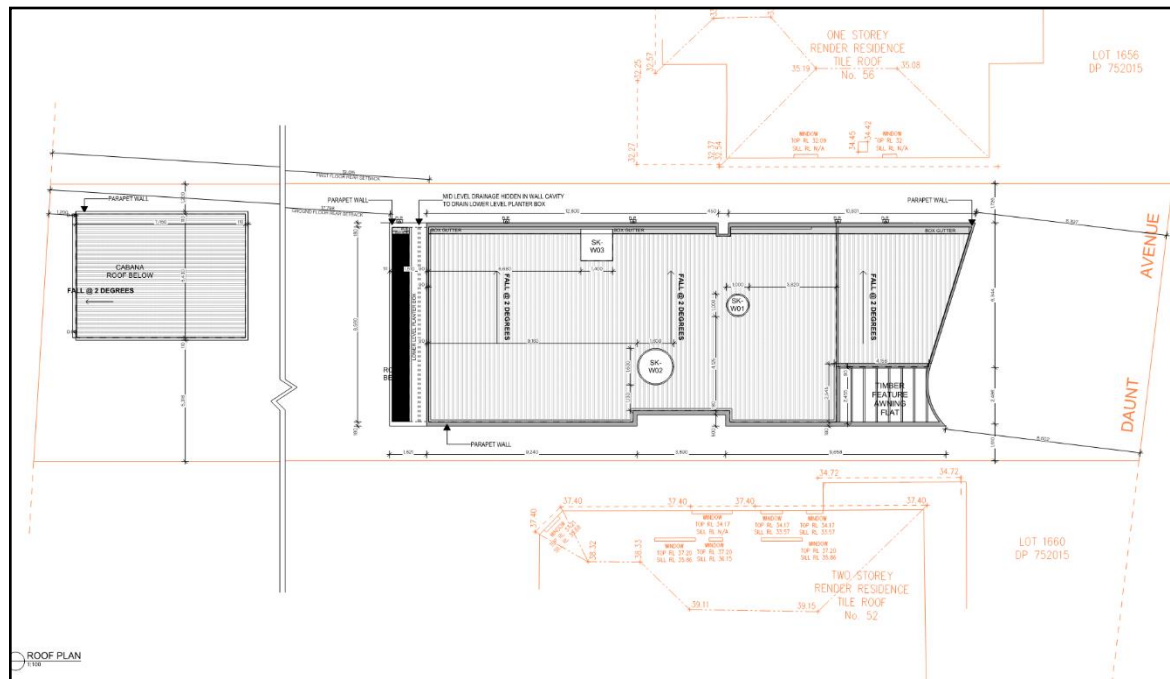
Roof Plan - 54 Daunt Avenue: (Source: Prime Design Studios)
